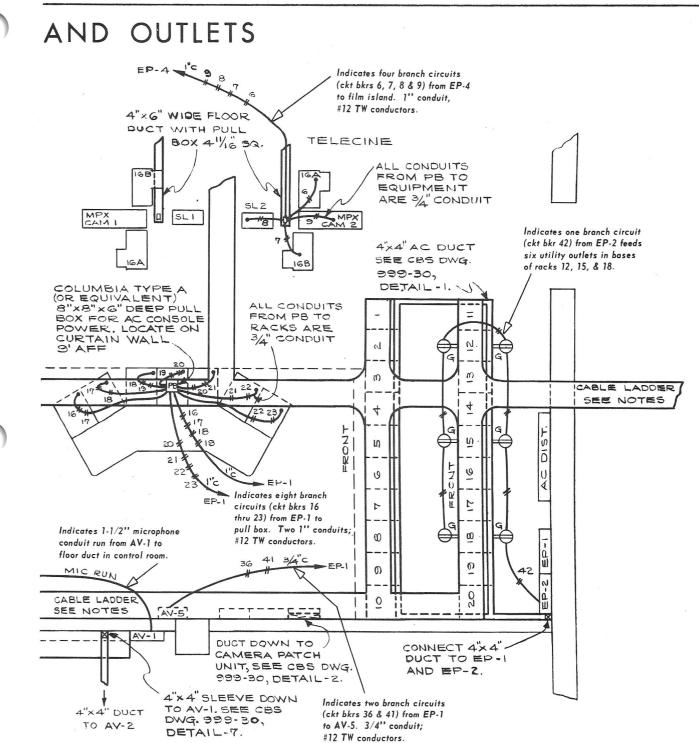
Conduit, duct, and outlet layout of a portion of the technical area of a television plant. To avoid conflicts, right-of-way for overhead cable ladders and ductwork must be coordinated with installations of air-conditioning ducts, water pipes, and similar installations. www.SteamPoweredRadio.Com
